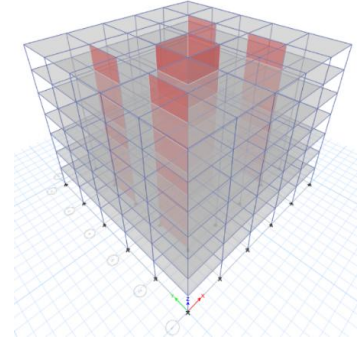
Model 11 - core shear wall at center with walls at the inside in one direction
